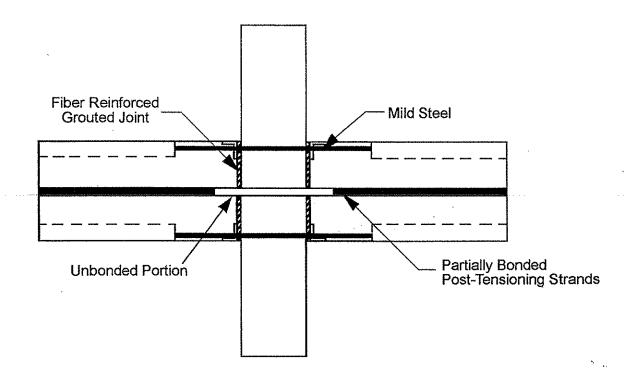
NIST Precast Post-Tensioned Beam-Column Connection
